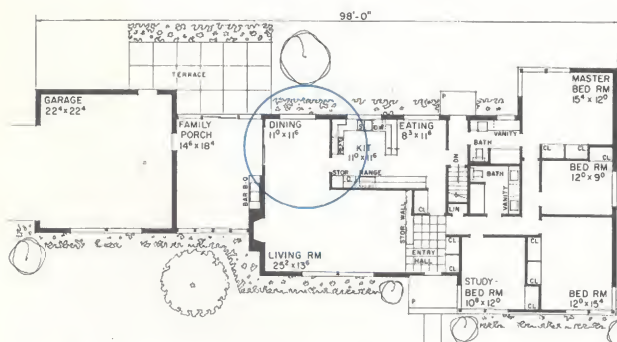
An open dining-plan. (Home Planners, Inc.)
